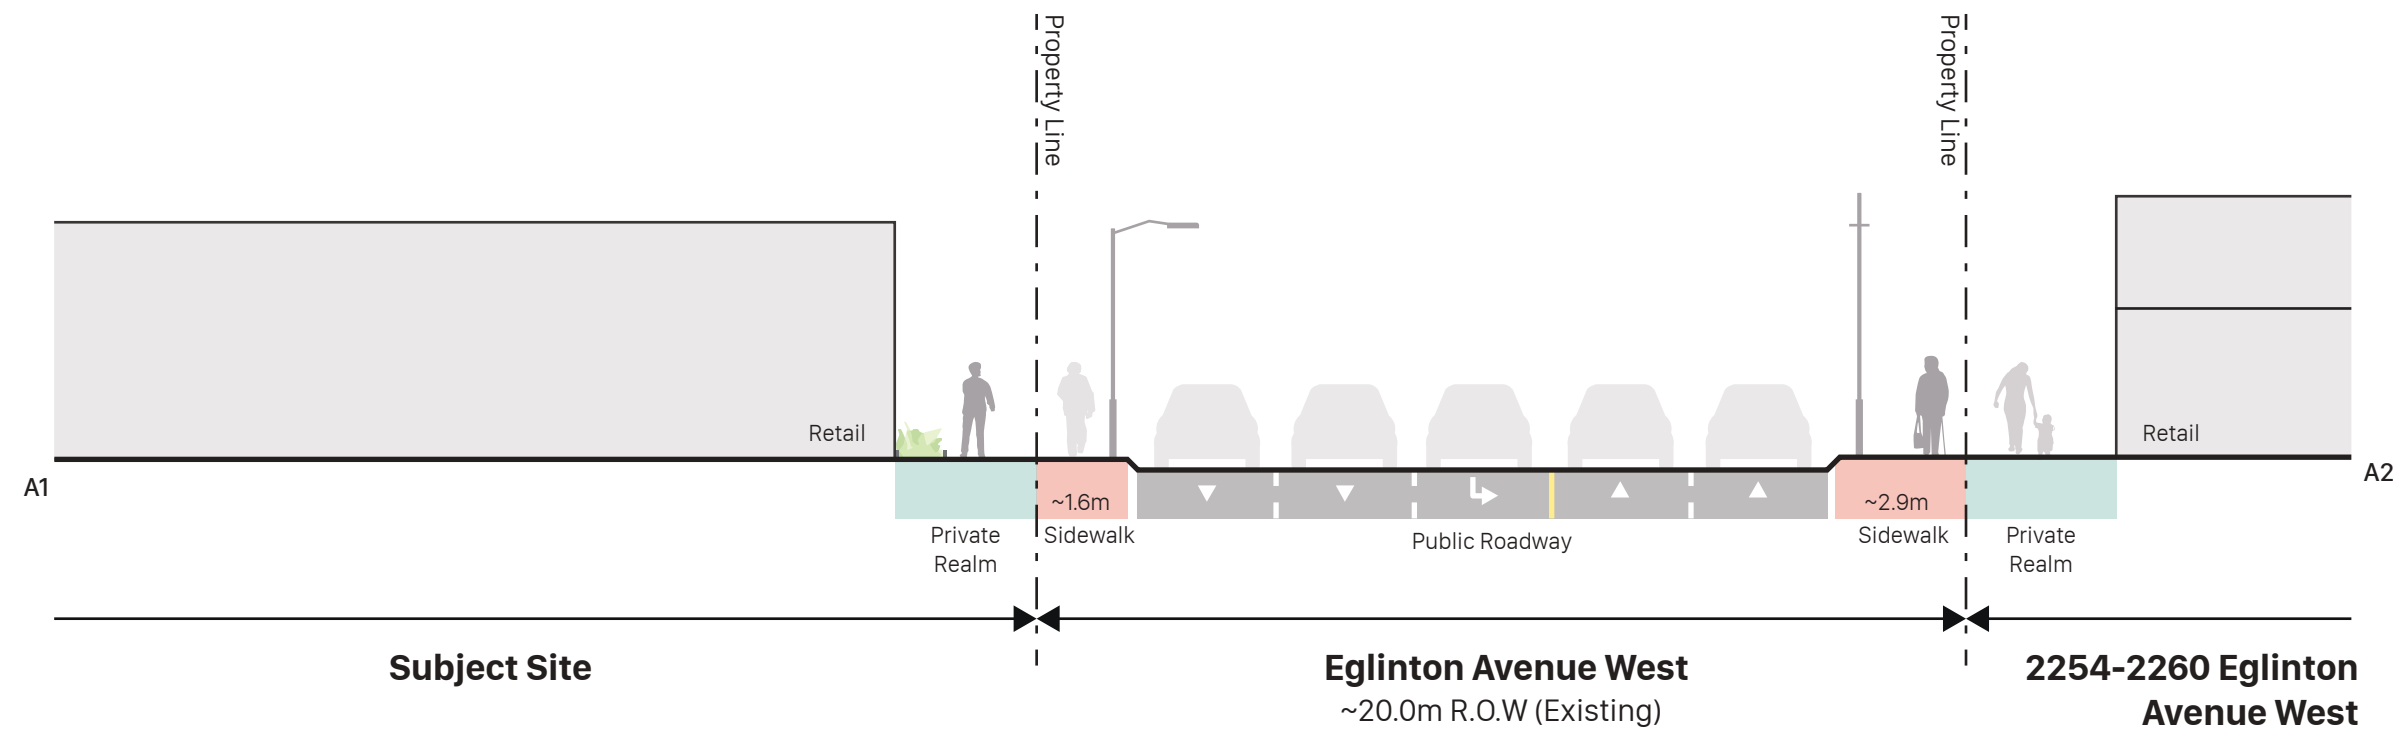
Section A1-A2 Eglinton Avenue West (Existing)
